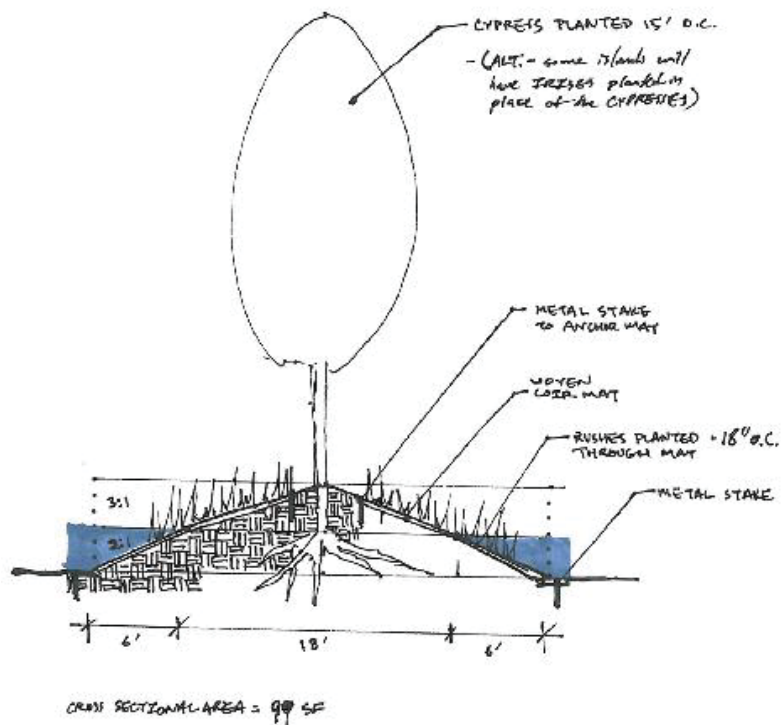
Typical cross-section for cypress plantings in proposed lagoons in 40 Arpent Canal.
